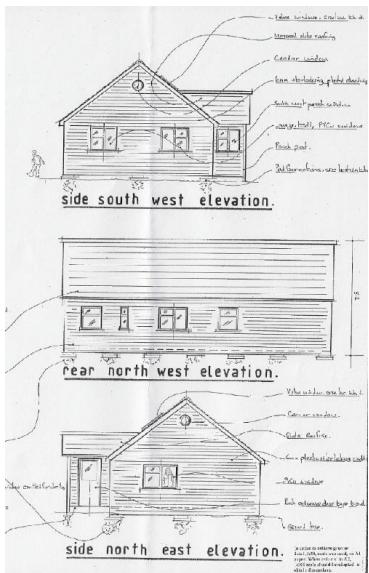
Plans submitted under refused application 73164 and withdrawn application 74608
